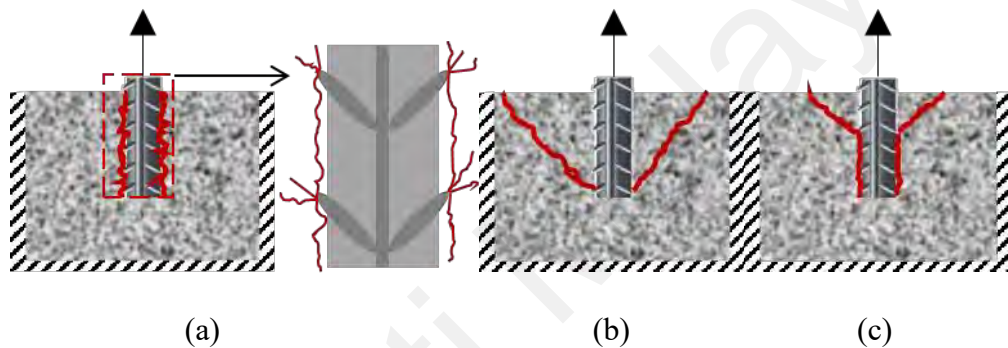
Bond failure scenarios – (a) concrete pull-out; (b) concrete split; (c) combined effect of concrete pull-out and concrete splitting
